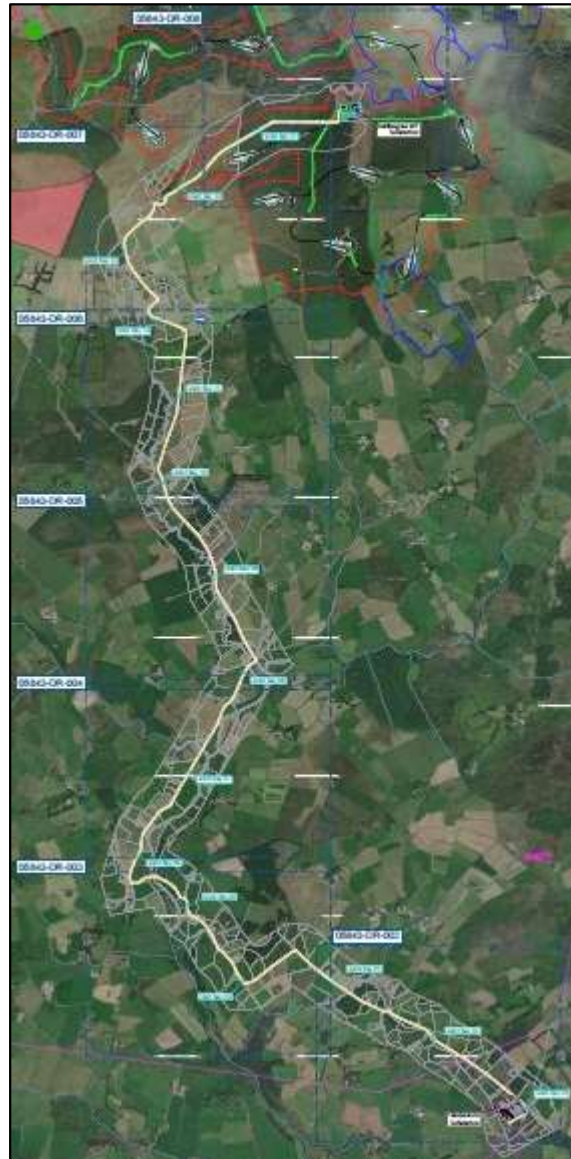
Grid Connection Route Location (See Drawings 05843-DR-001/008)
